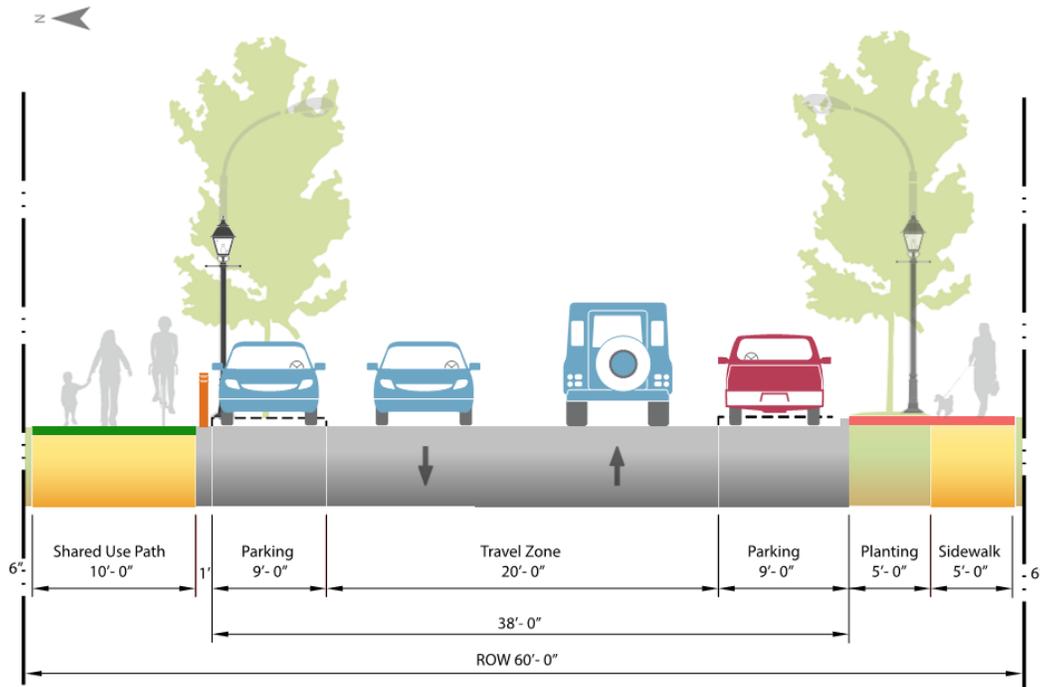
Proposed East Railroad St Complete Street Cross Section
